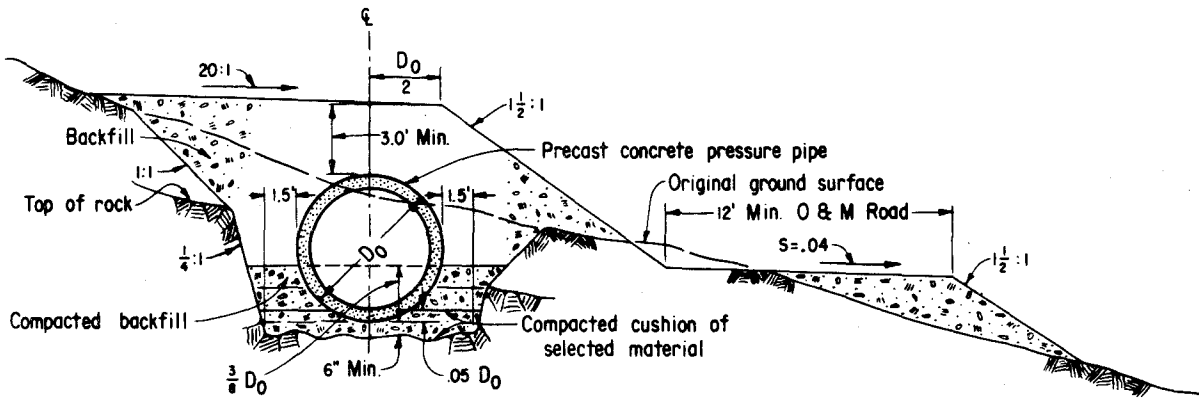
Concrete pipeline for bench construction. 103-D-1258
